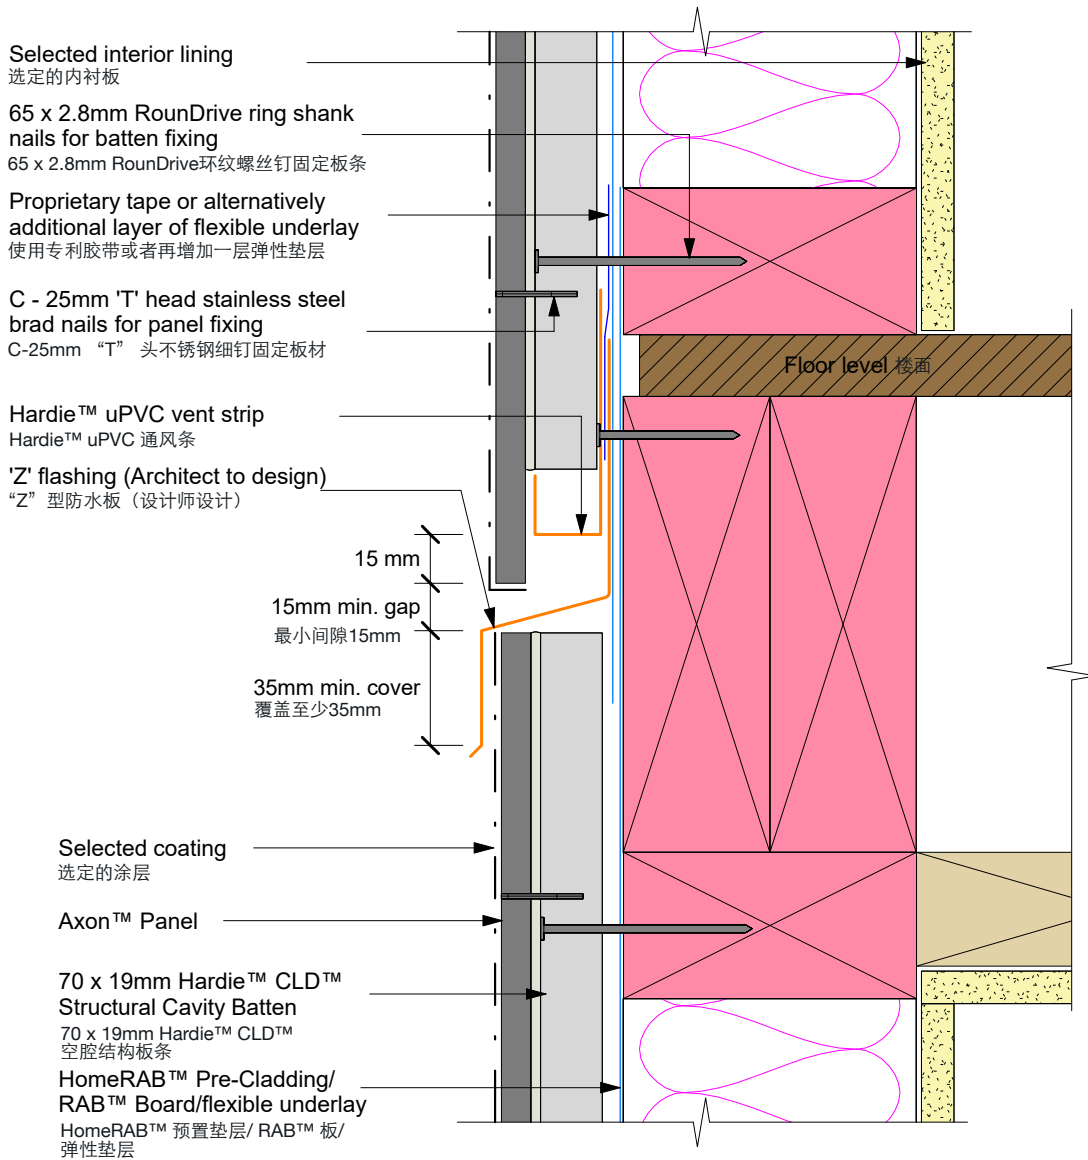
Drained flashing joint at floor joist | 图45: 地板龙骨高度排水防水接缝
